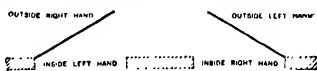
“Handing” of Casement Fasteners and Bolts.
